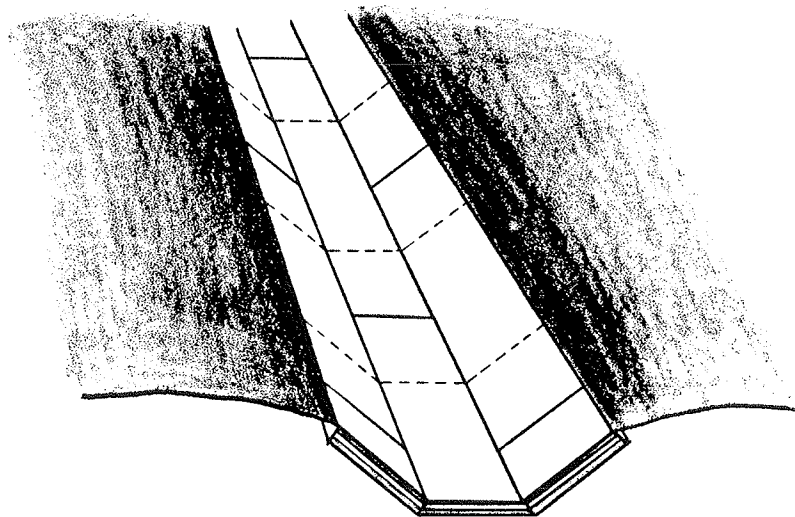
Precast concrete slabs provide a convenient means of lining steep sections of ditches where turf does not give adequate protection. Slabs are cast at a central location and assembled in the ditch.
